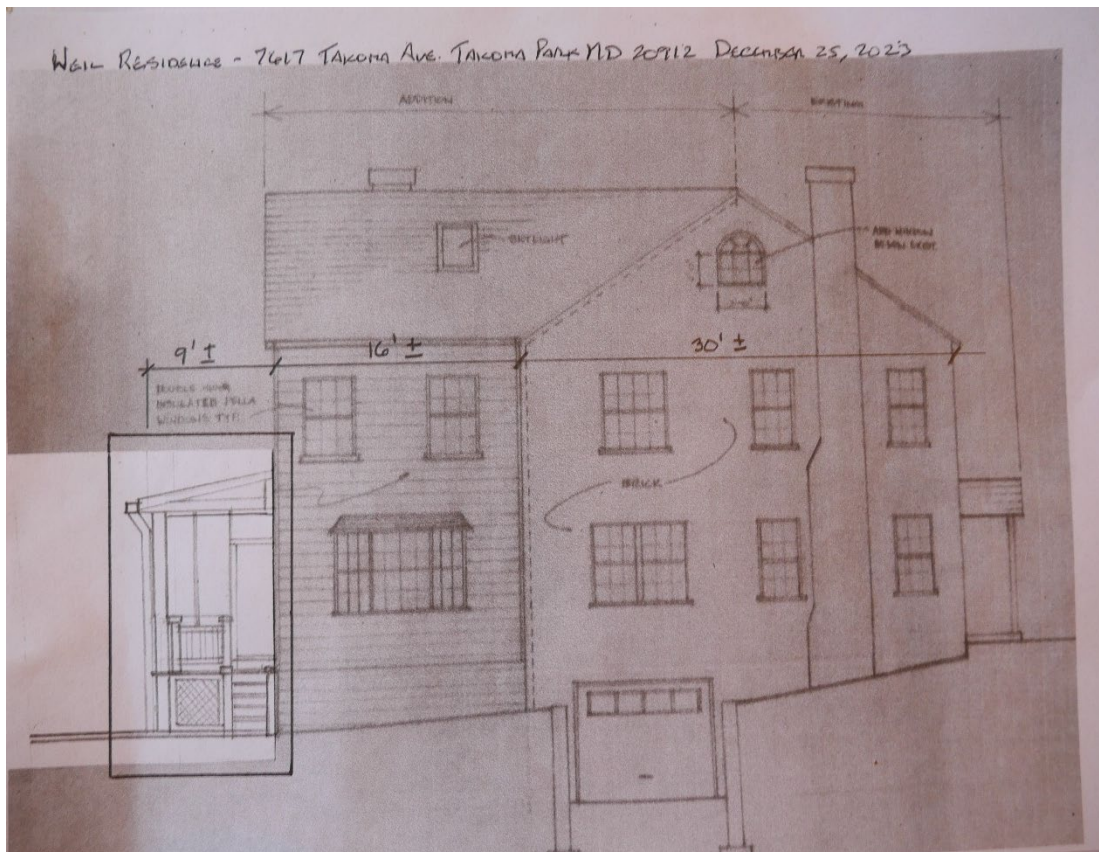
The left-side elevation of the residence as it will appear on the broader elevation.
